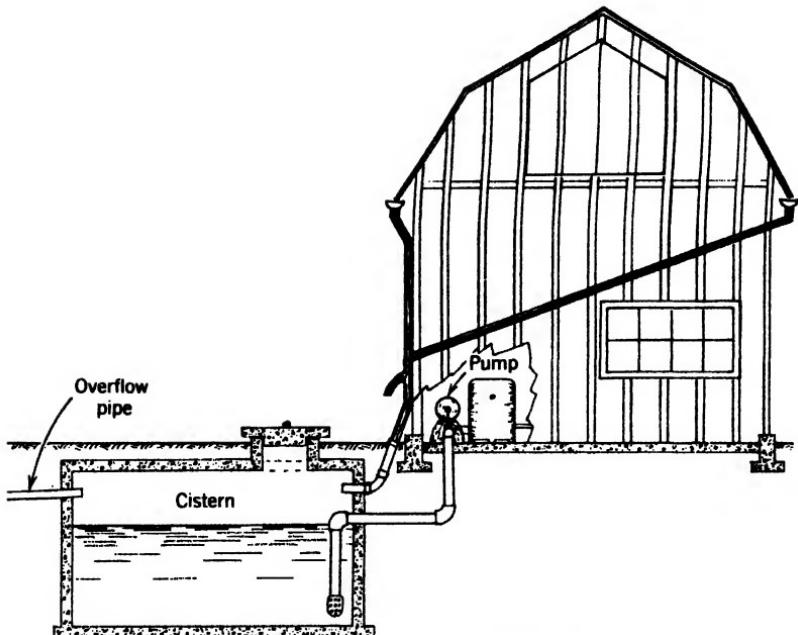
A large-capacity underground concrete cistern. A large-capacity pump installed on such a cistern will provide water for fire fighting. The manhole provides access for the suction hose of fire-fighting apparatus and for cleaning.
